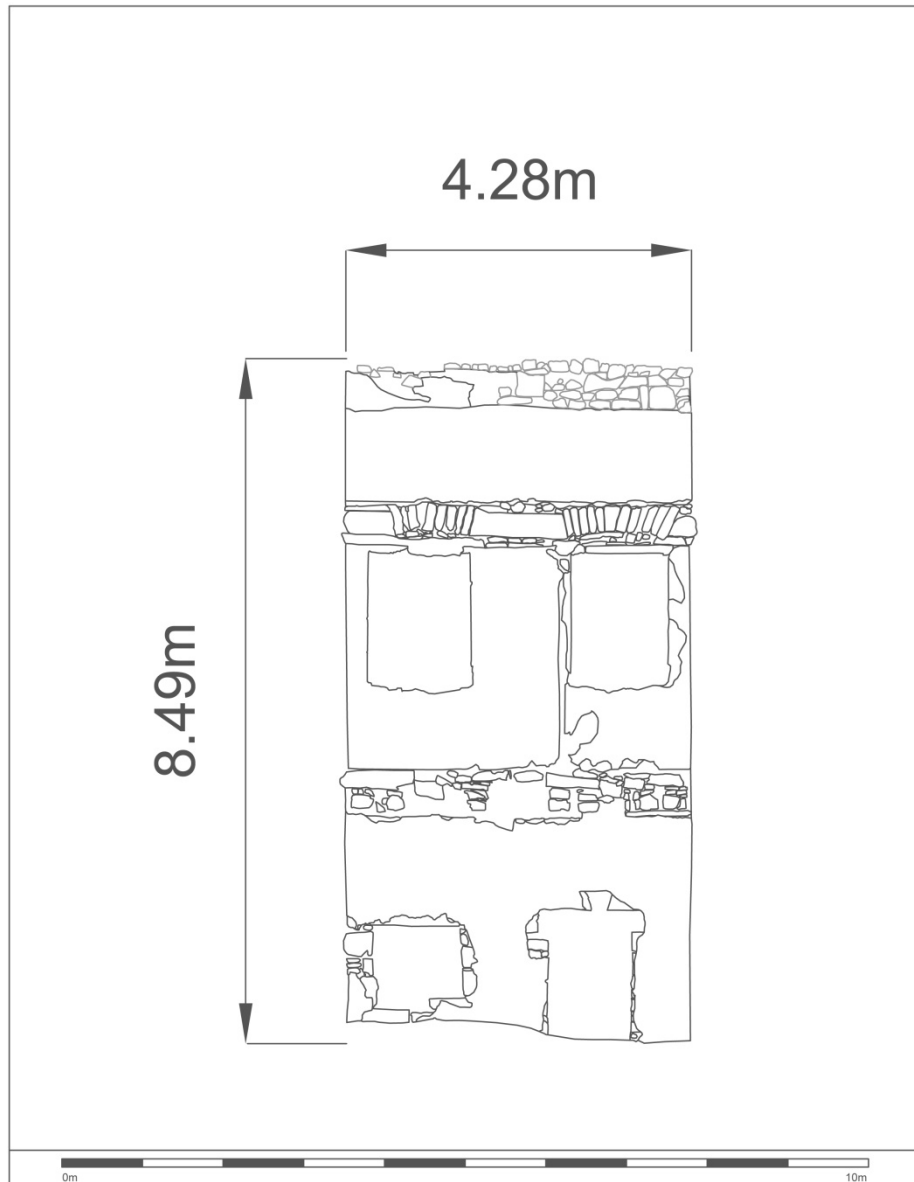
Internal elevation of the south-east wall of the signal tower at Inishmore Signal Station.
